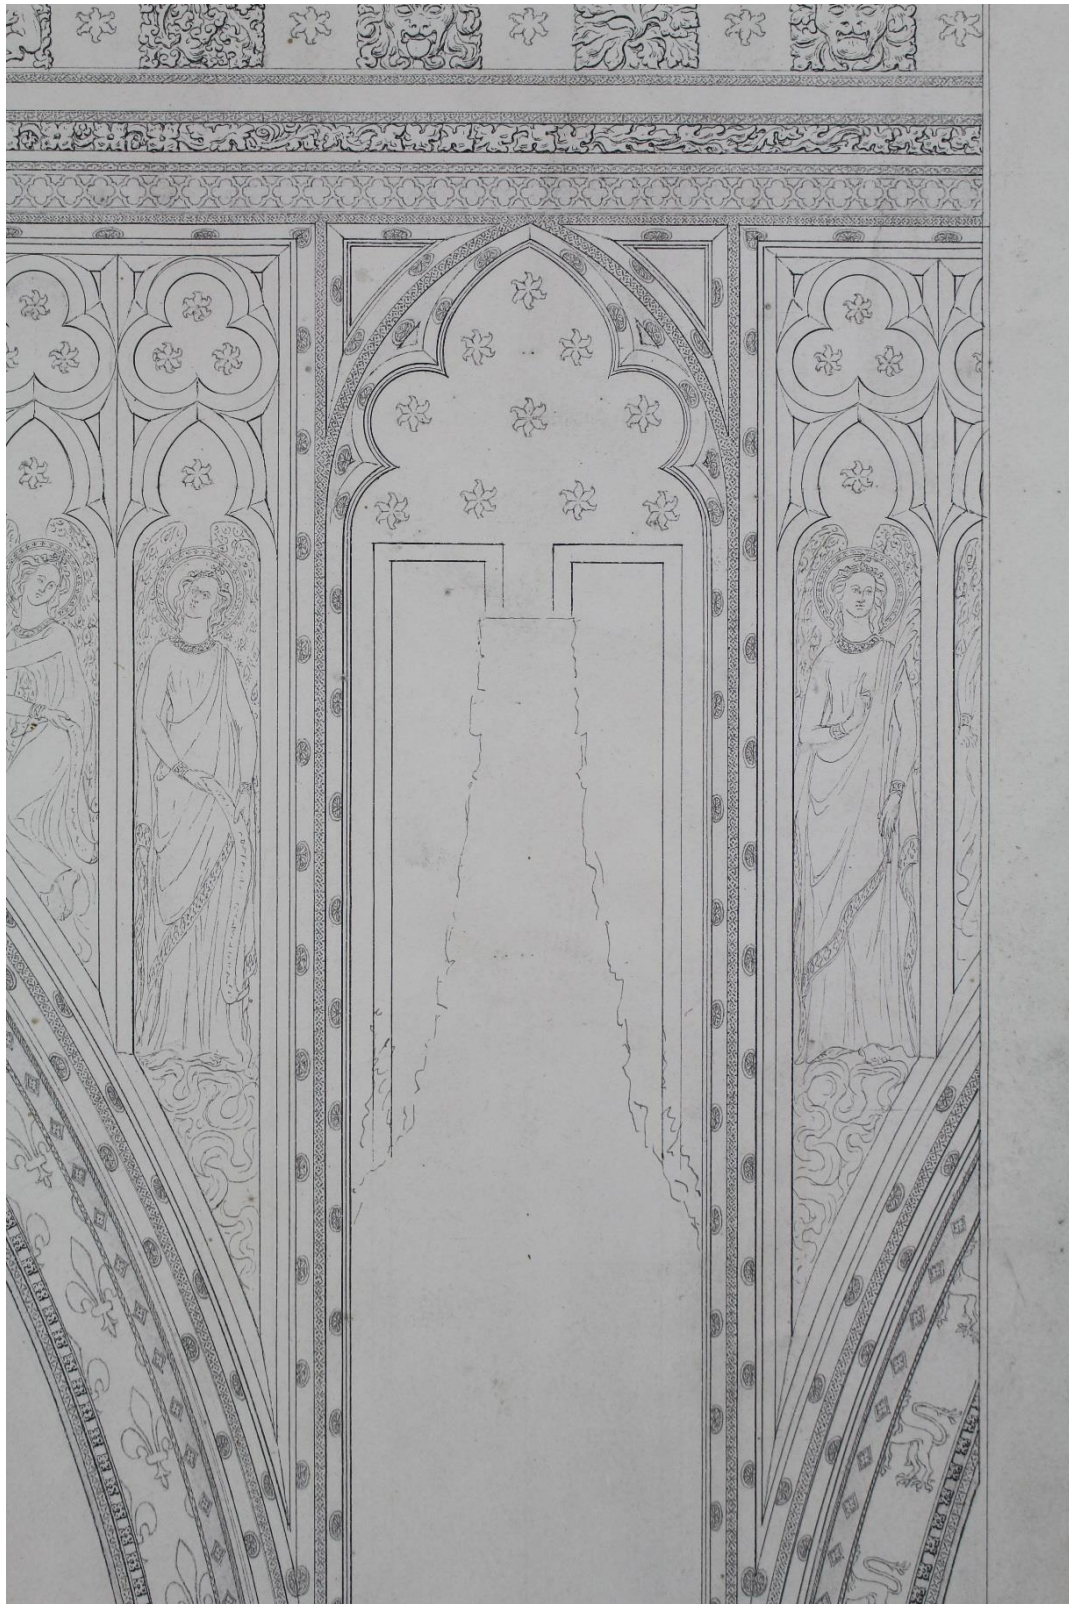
Frederick Mackenzie, Detail of Upper Chapel pier elevation, before 1844. Pen, ink and watercolour. The National Archives, Work 29. [DRA 100 (Mac)].
